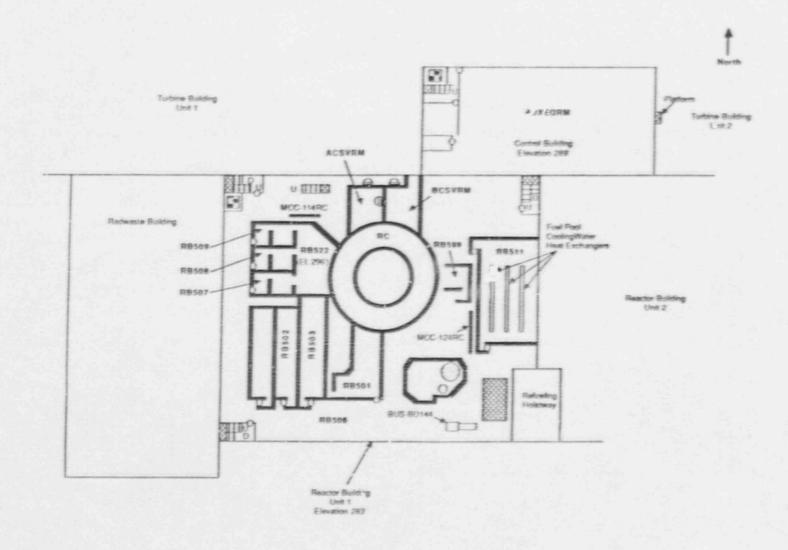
Limerick 1 General Arrangement, Elevations 283', 289', and 296'
